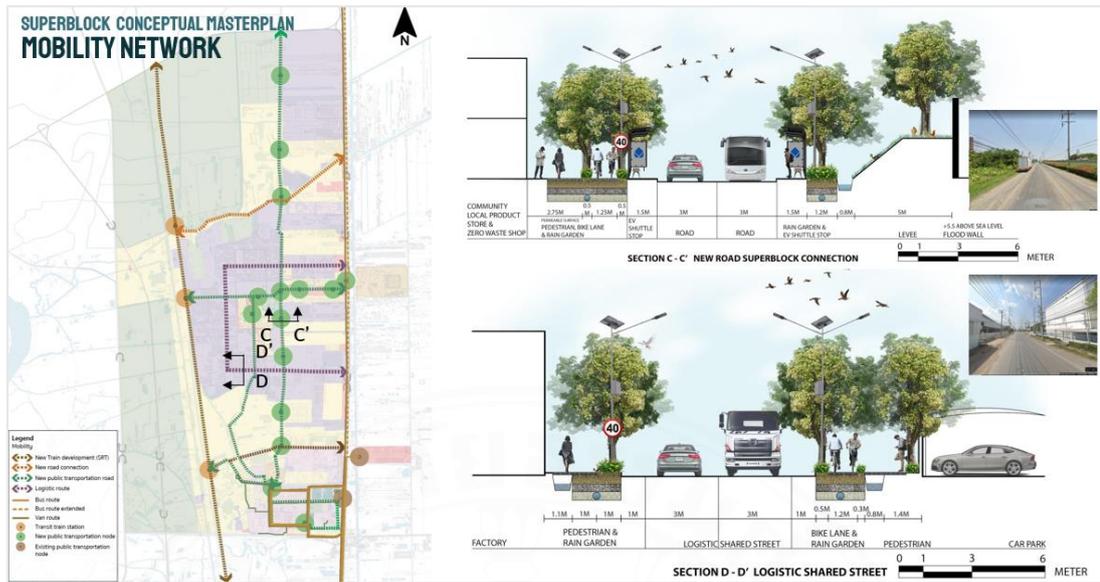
Bioretention cell design to improve 2 major transportation roads named as section C (above) and section D (below)
